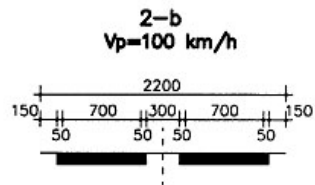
Overview of cross-section dimensions (Source: Rulebook on essential road safety requirements for public roads outside urban areas and their elements regarding road safety (OG no. 110/01))
